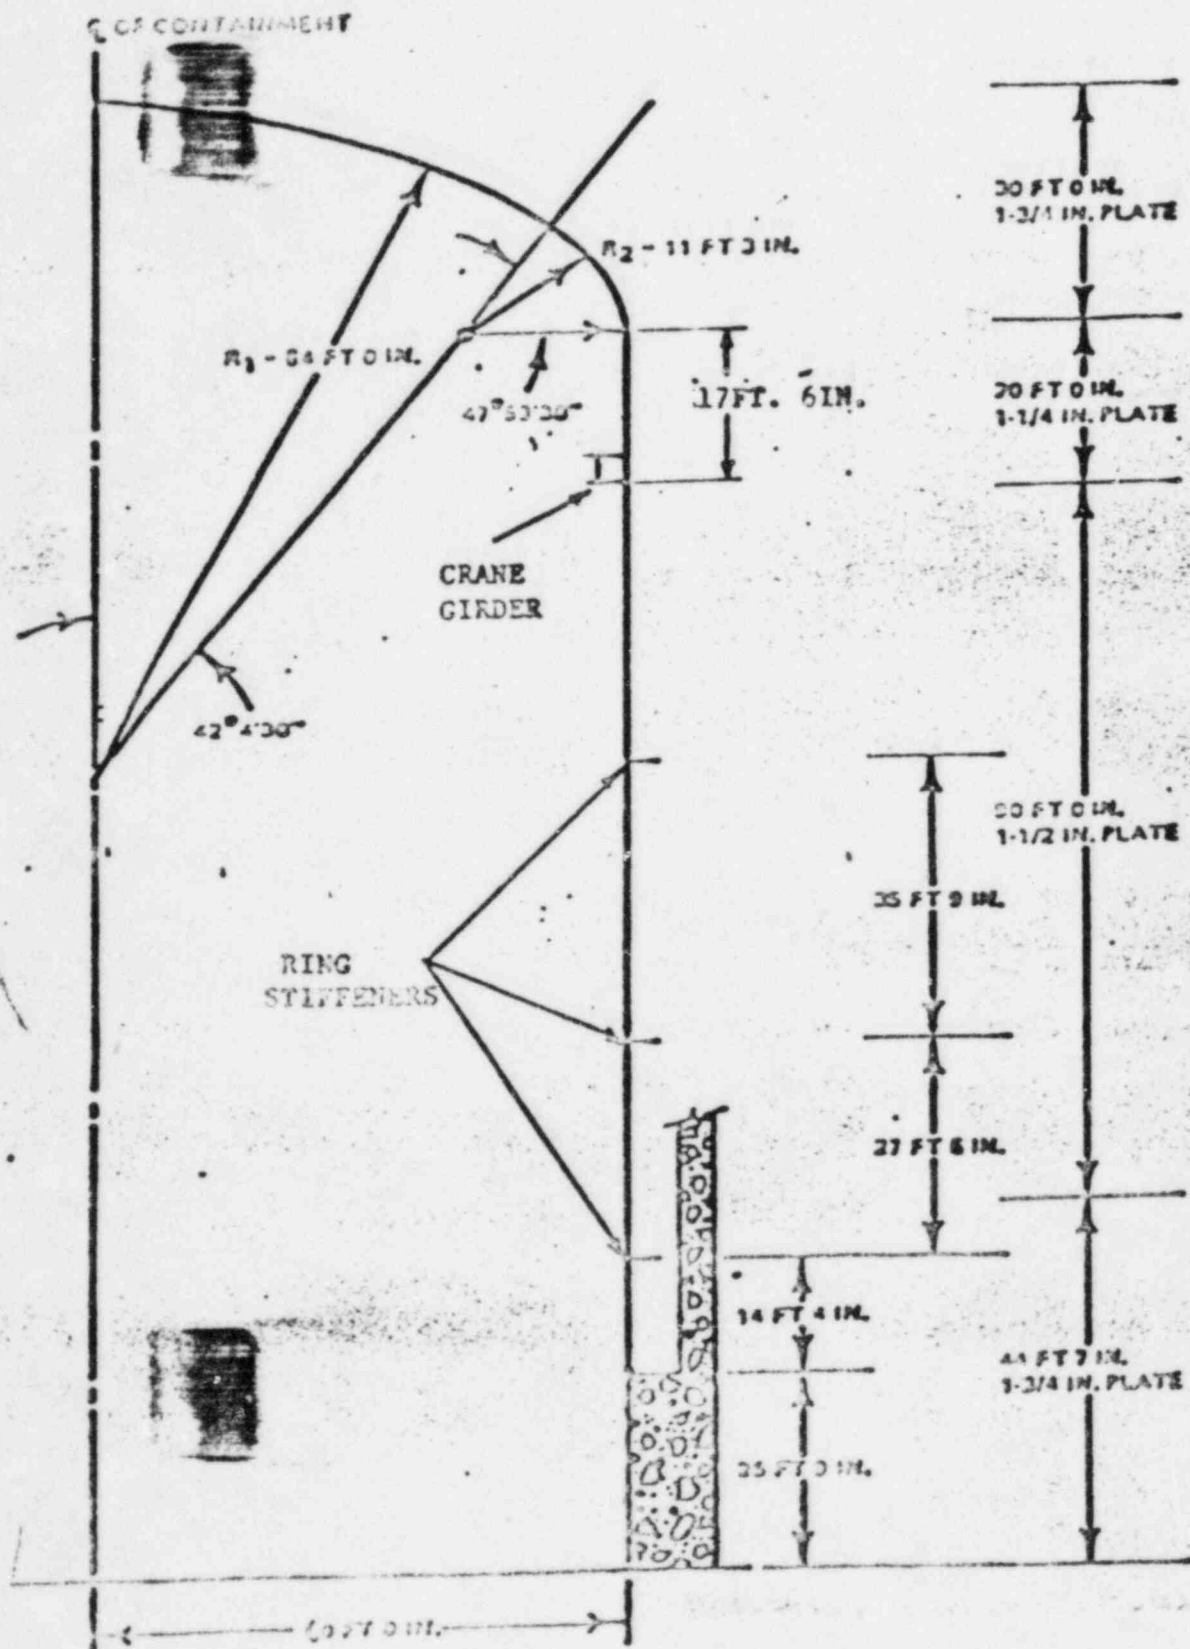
Geometrical Details of Torispherical Steel Containment
